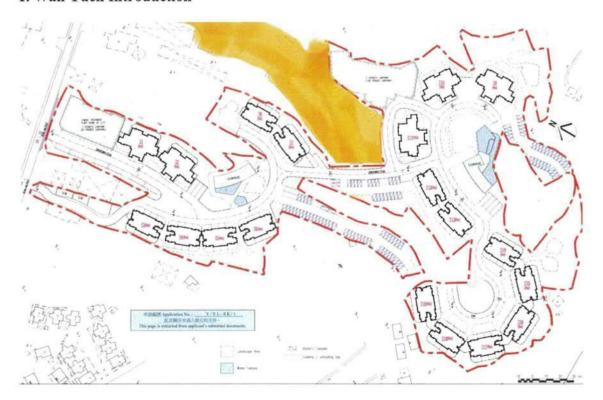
Wah Yuen, as shaded in yellow (Source: Gist Pg 9: Indicative Master Layout Plan)
